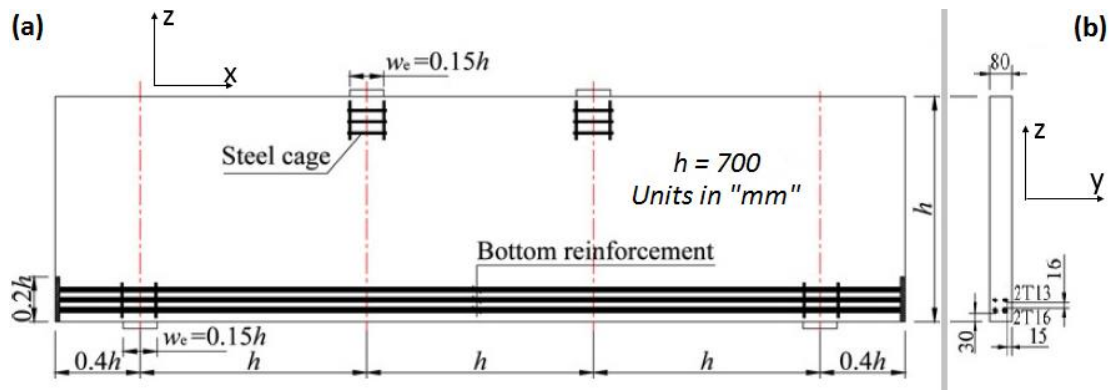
(a) Reinforcement layout of the specimen. (b) Cross section of the beam (Zhang and Tan 2007).
